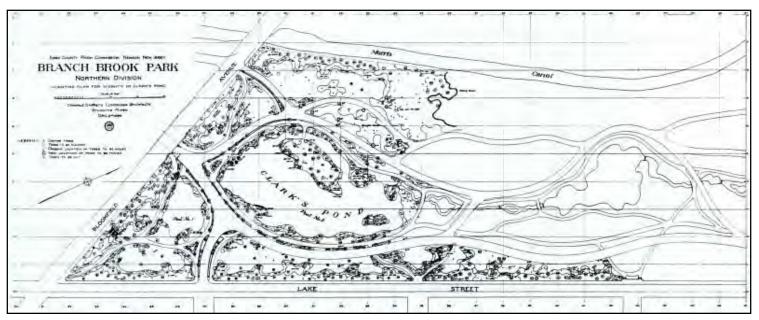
Planting plan for vicinity of Clark's Pond, Plan #2121-383, 6 December 1899. Source: ONHS.
